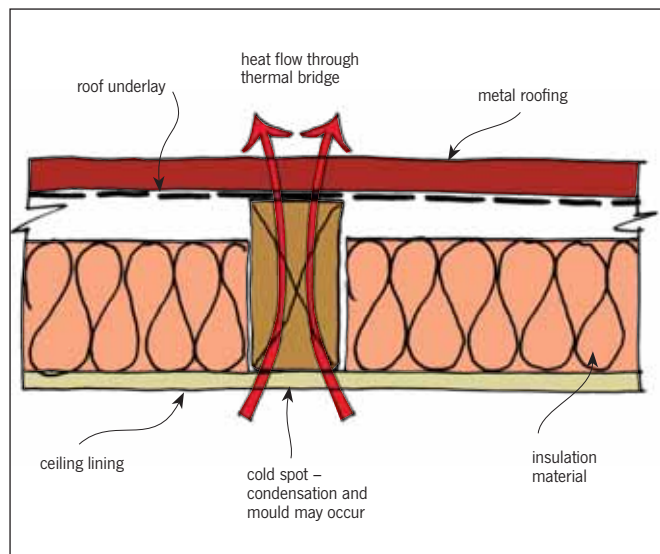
'Classical' thermal bridging – a highly heat-conductive path is provided by a bridging element connecting the ceiling and roof.
